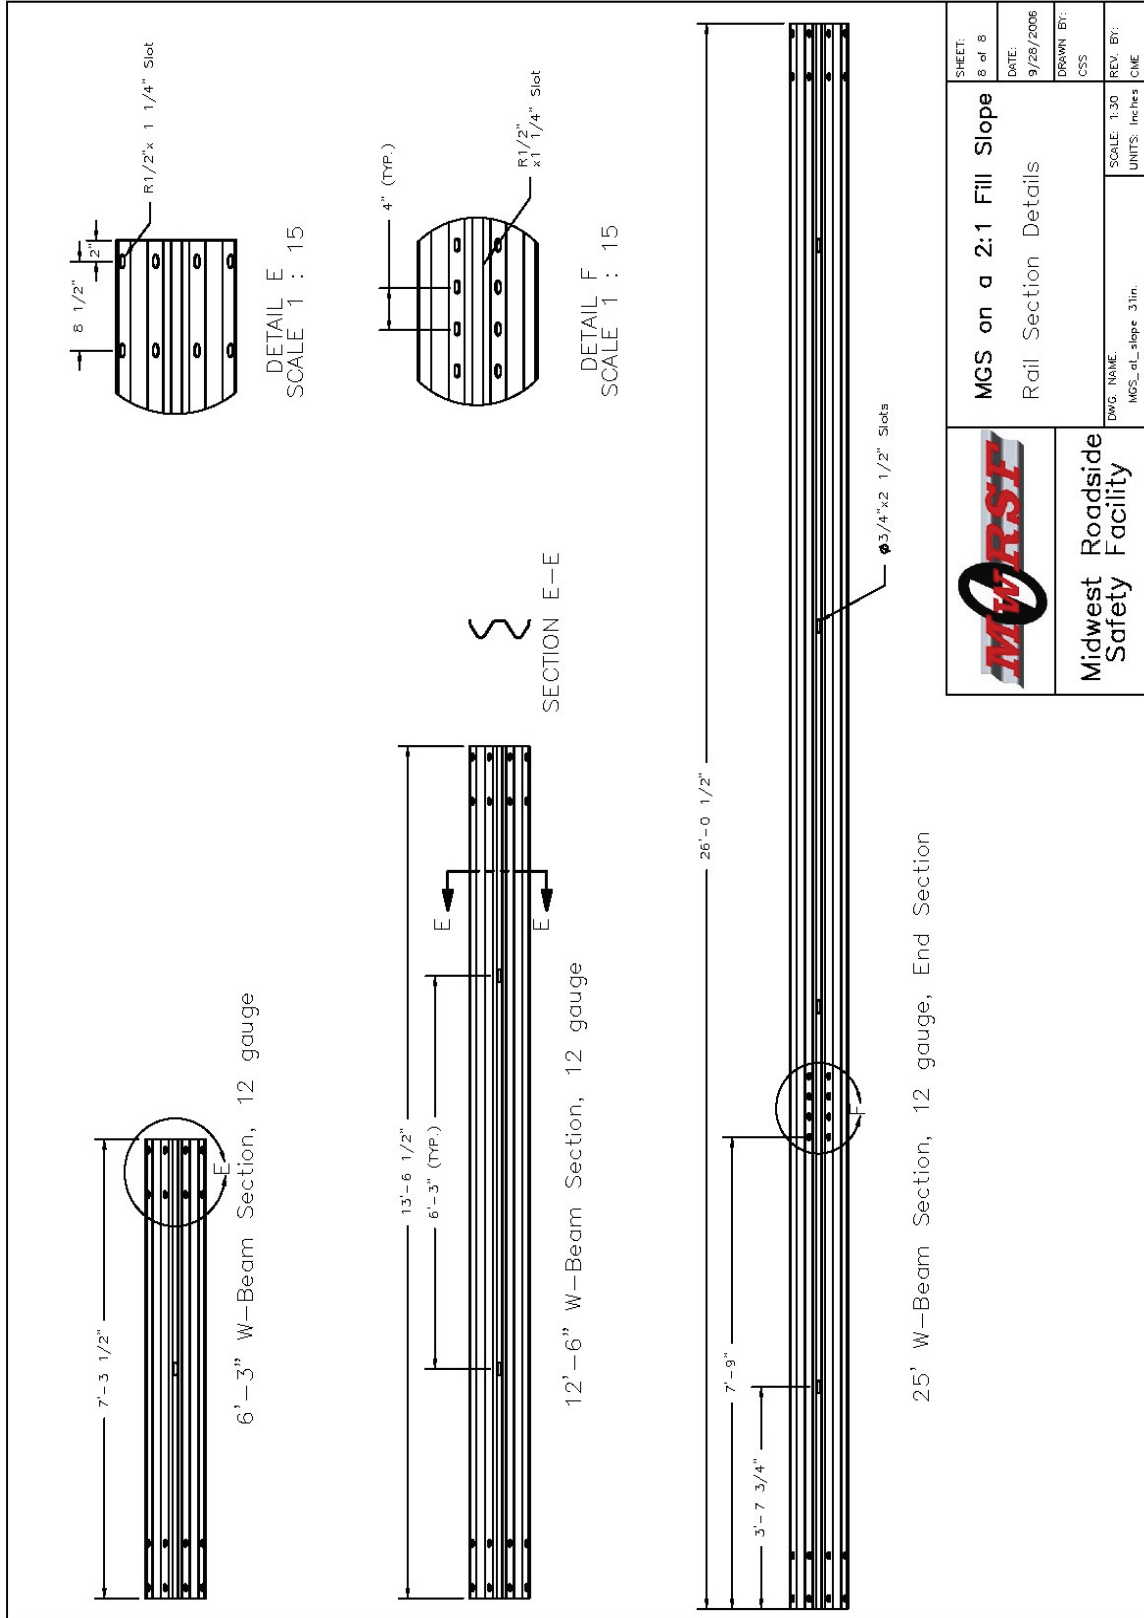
Rail Details, Test No. MGS221-2 (English)
